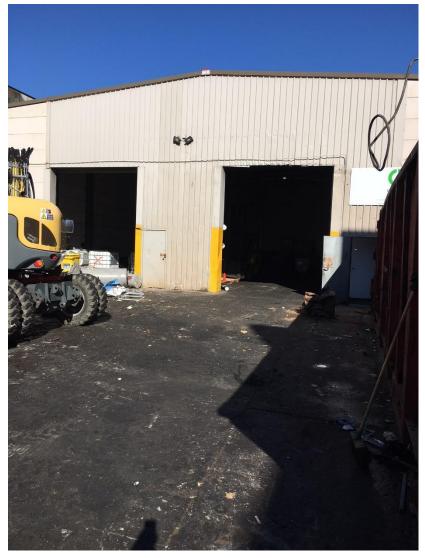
View of the rear warehouse building at No 52 Buffalo Road which is to be retained.
